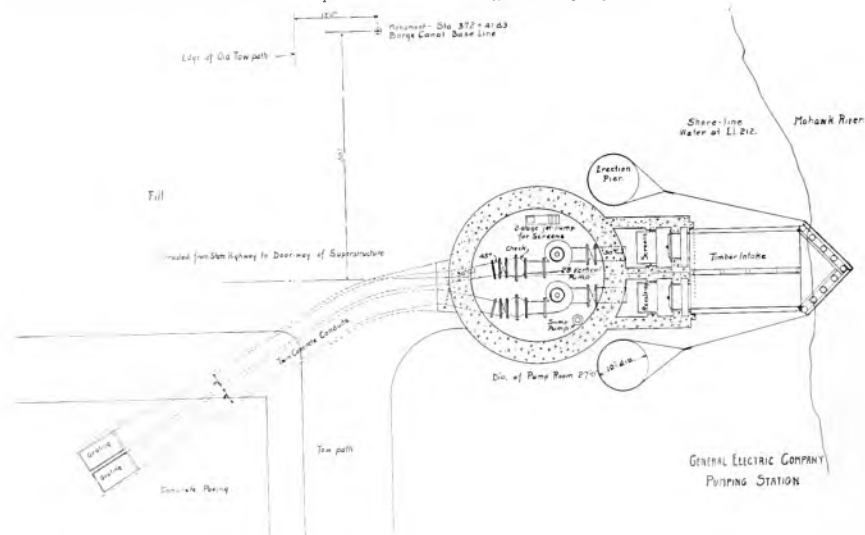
General Layout of Station, Intake and Discharge Conduits
